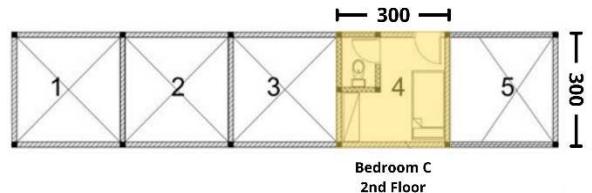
The position and the layout plan of Bedroom C in the second floor
